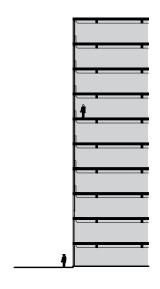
Building 15, Ermou and Nikis str. SSW street view
